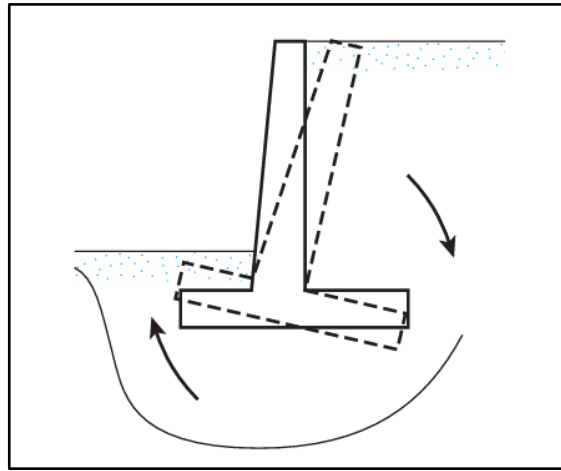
Bearing Capacity Stability Failure of Retaining Wall (Das, 2011)
